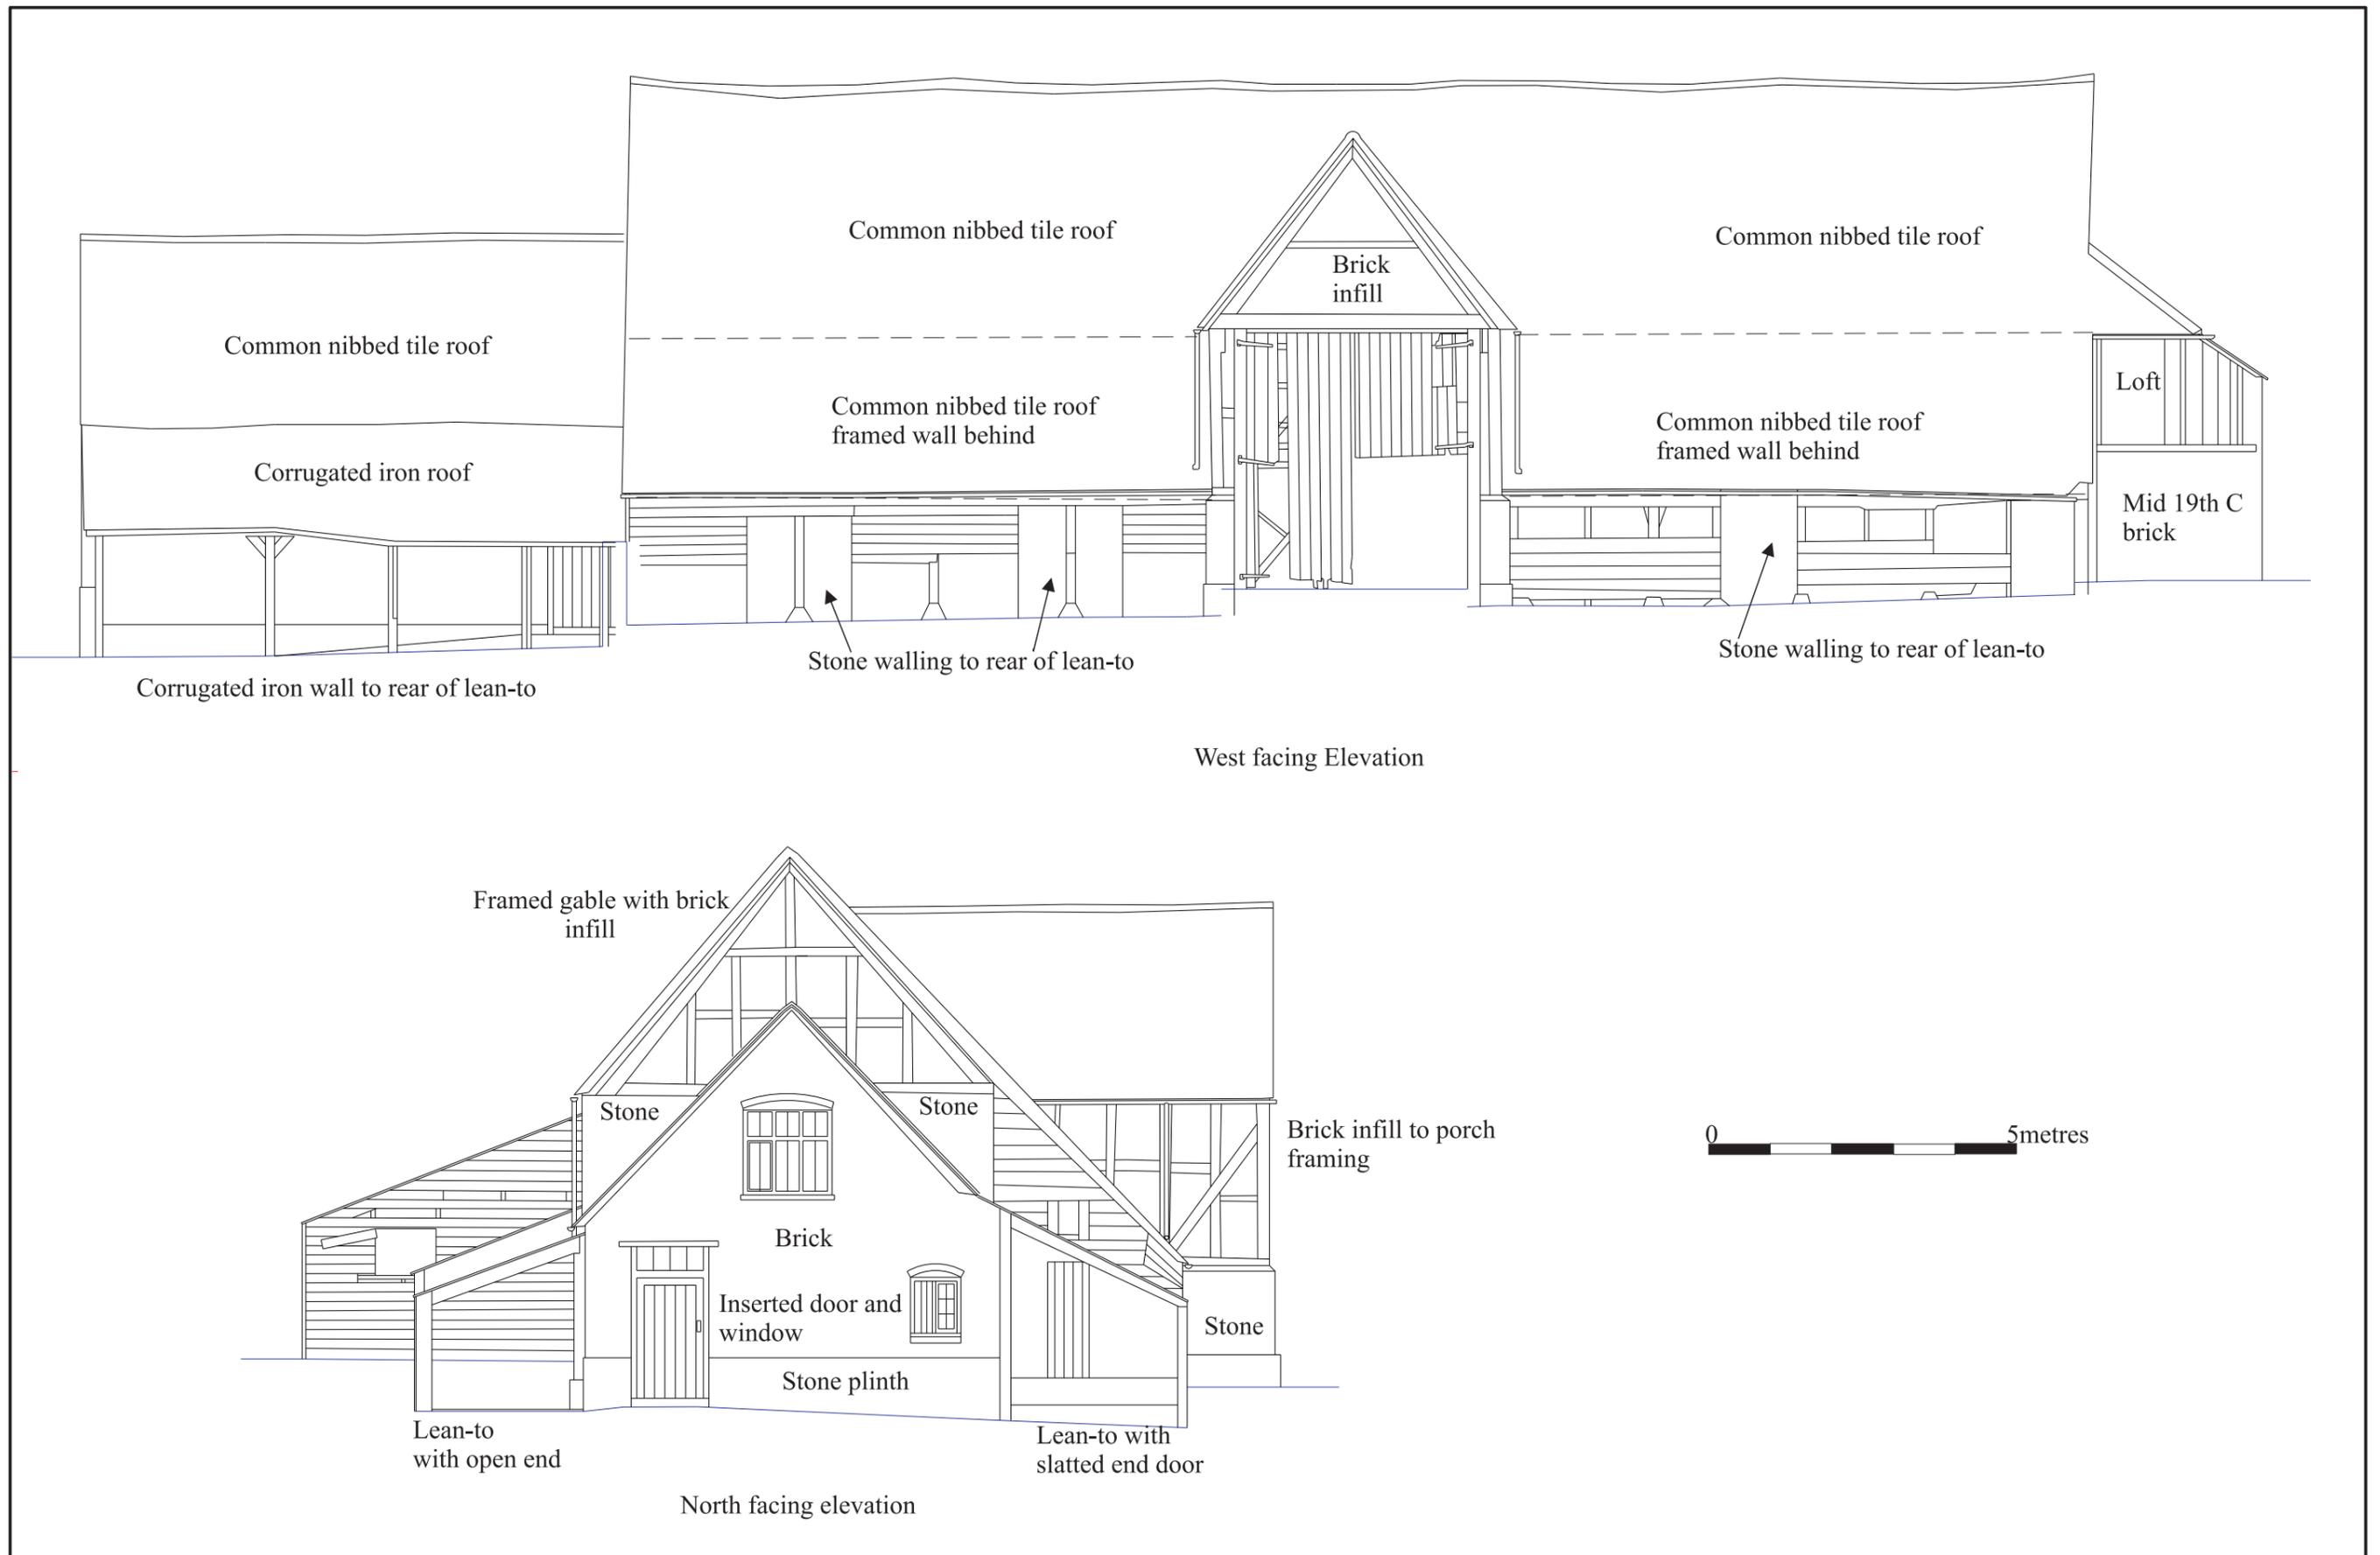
North and West elevations of barn (based on 2009 survey drawings by A D Horner Ltd)
